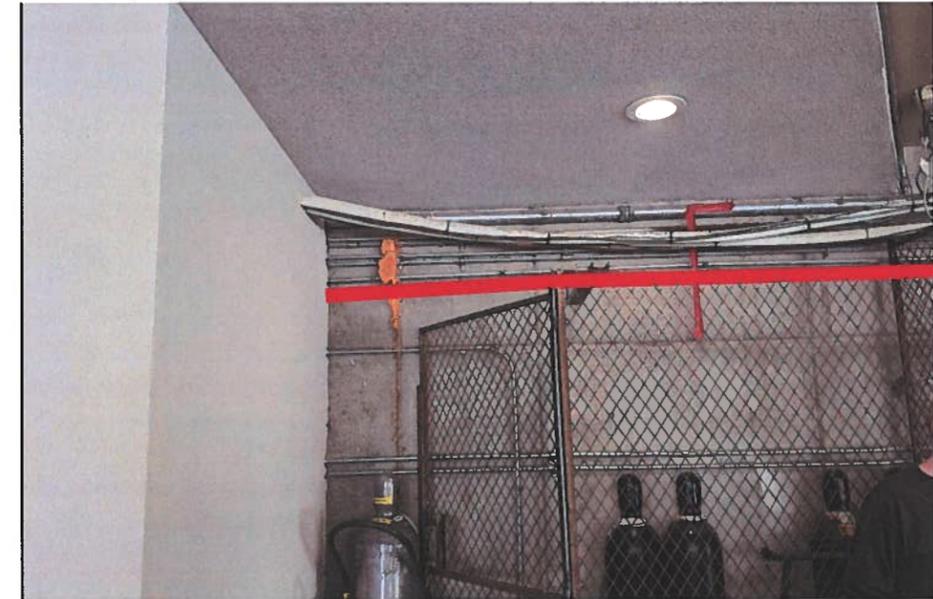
PROPOSED BUILDING PENETRATION INTO SOUTHEAST WALL OF STORAGE ROOM WITH 2" EMT CONDUIT. (FACING EAST) - SECTION C-C
